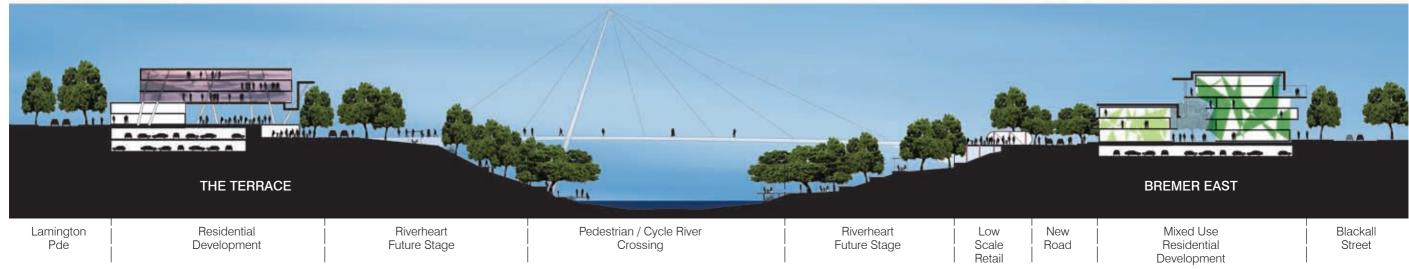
Bremer East - Detailed concept plan of proposed bridge link to The Terrace
